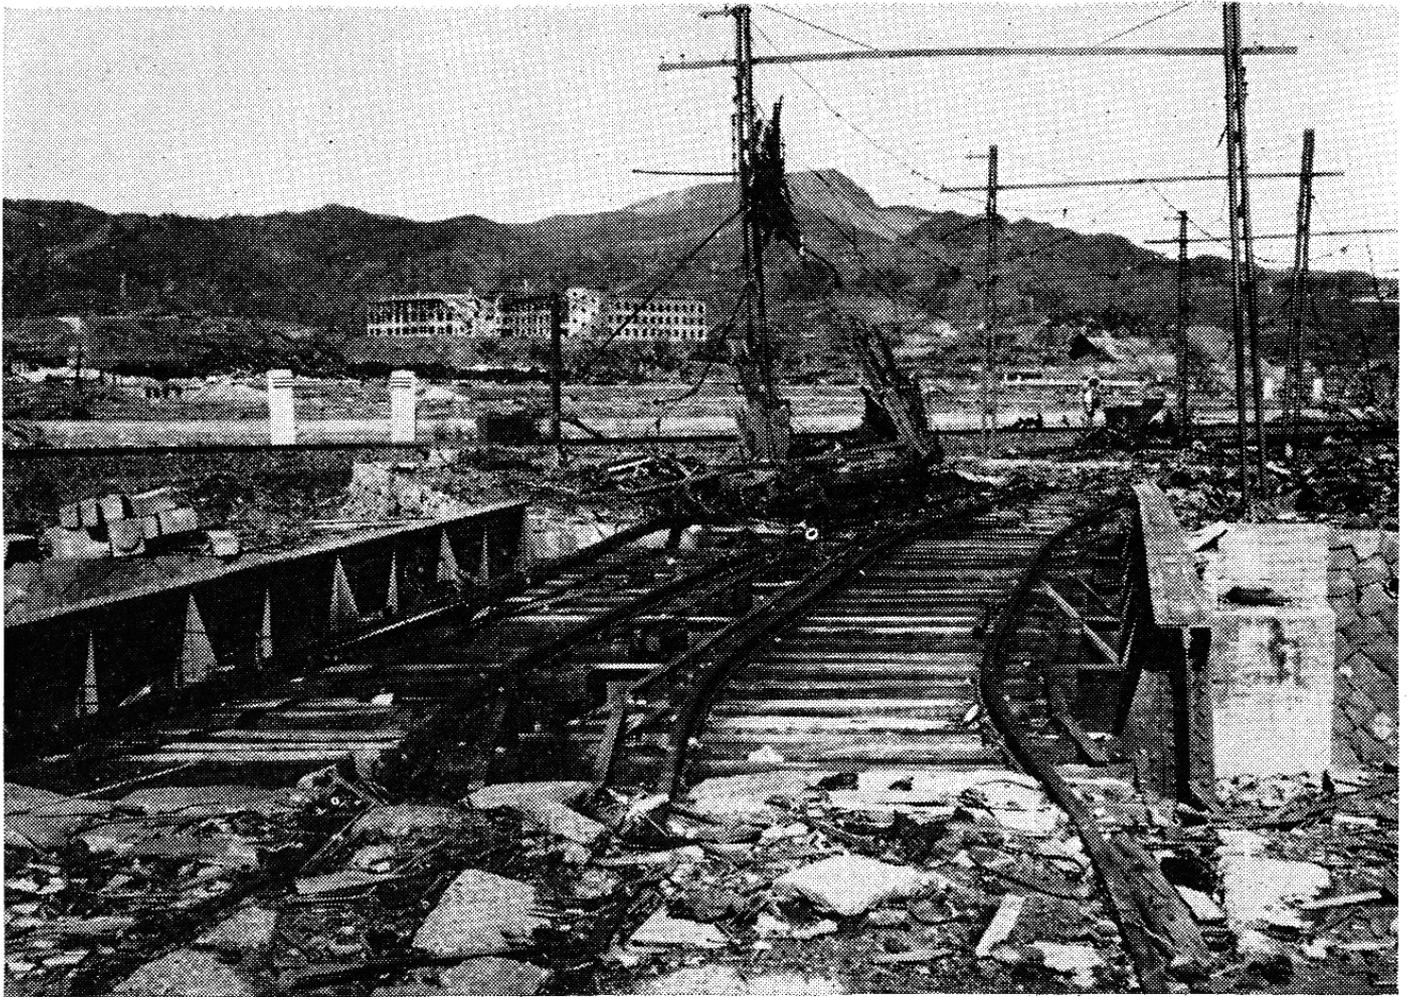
Steel-plate girder, double-track railway bridge, about 840 feet from ground zero, 2,150 feet from point of explosion. The plate girders were moved about 3 feet by the blast; the railroad tracks were bent out of shape and trolley cars were demolished, but the poles were left standing.
